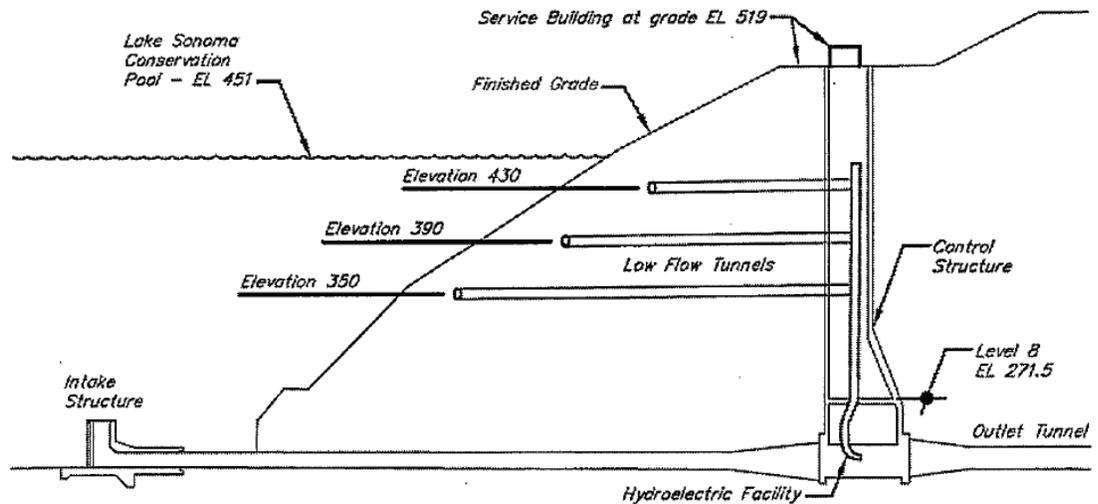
Section through Warm Springs Dam and Control Structure with Elevations of Water Draw-off Points. Tunnel pipe connection between EL 271.5 and EL 350.
